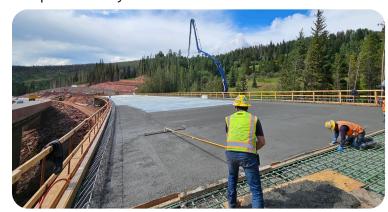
New Bridge Deck of the future I-70 WB over Polk Creek
